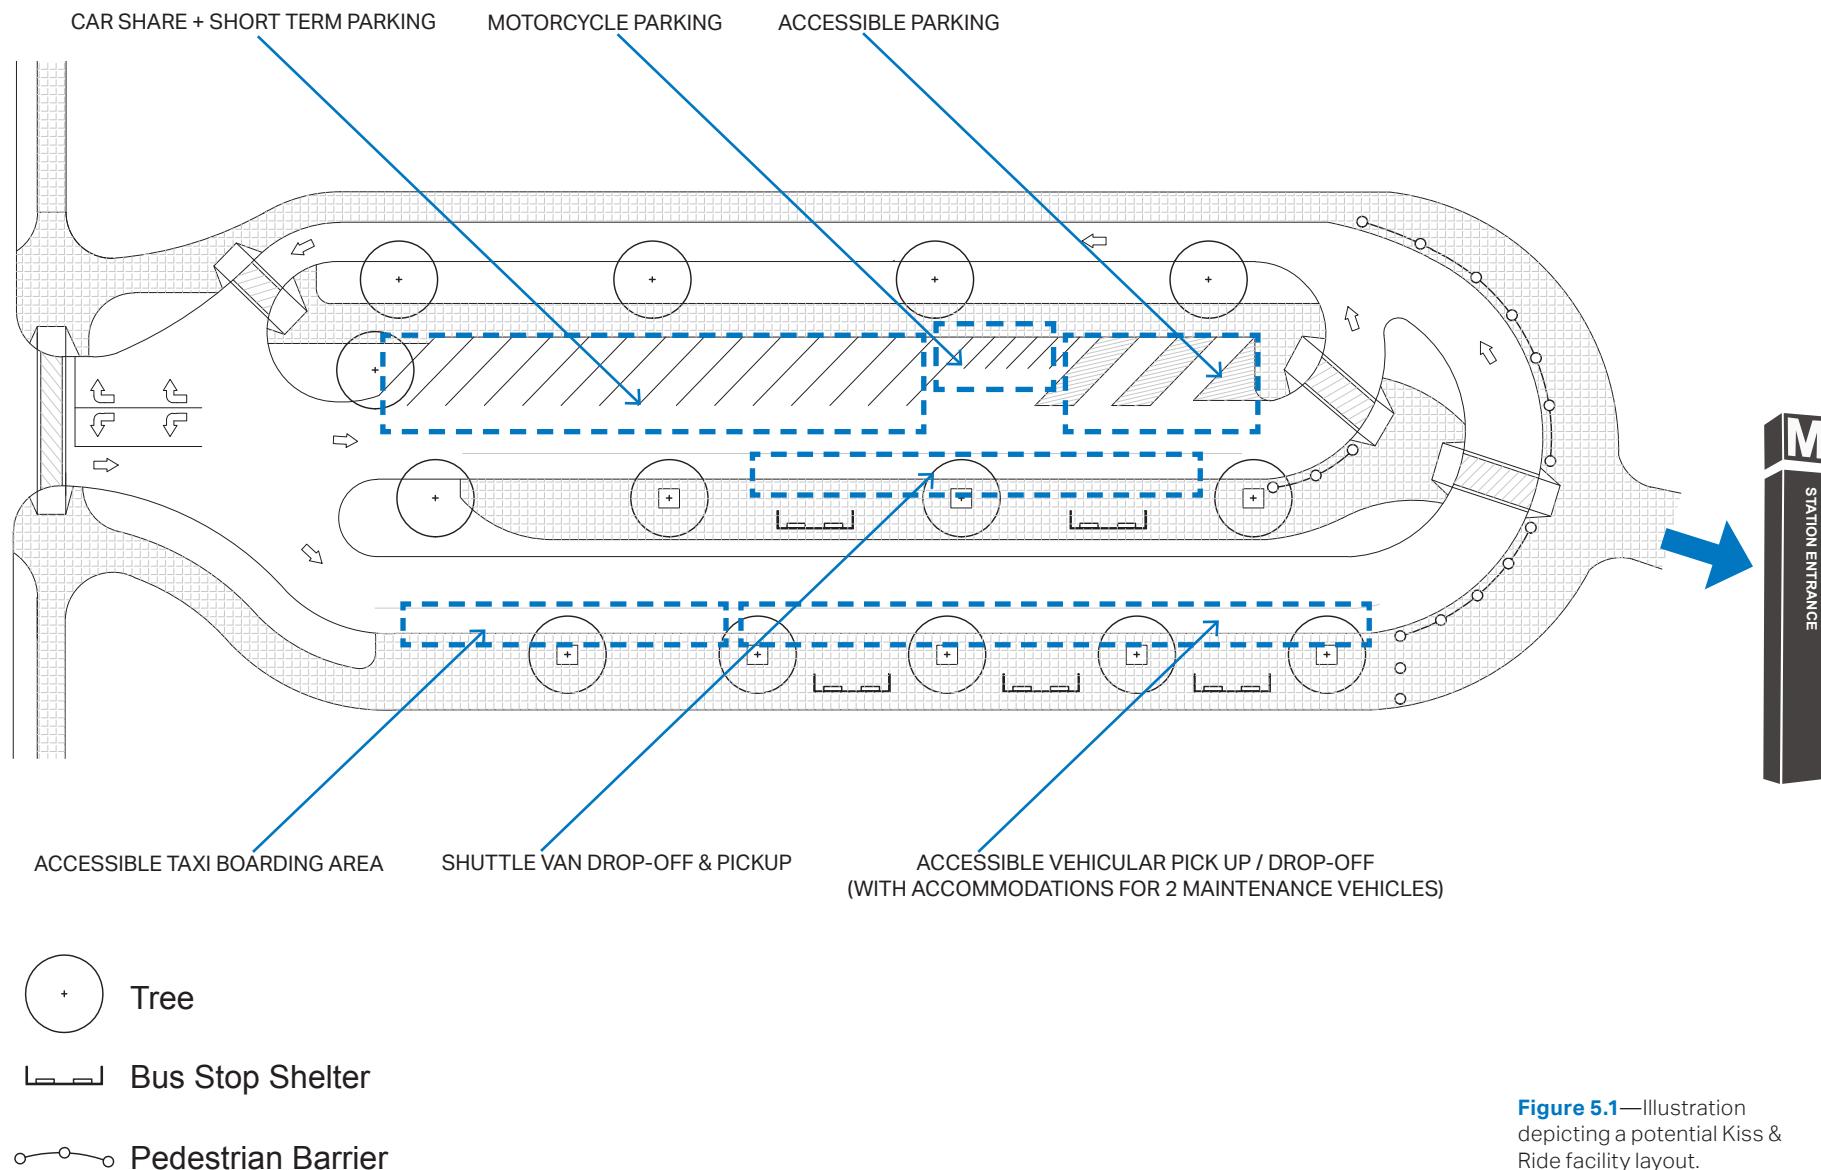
Illustration depicting a potential Kiss & Ride facility layout.
